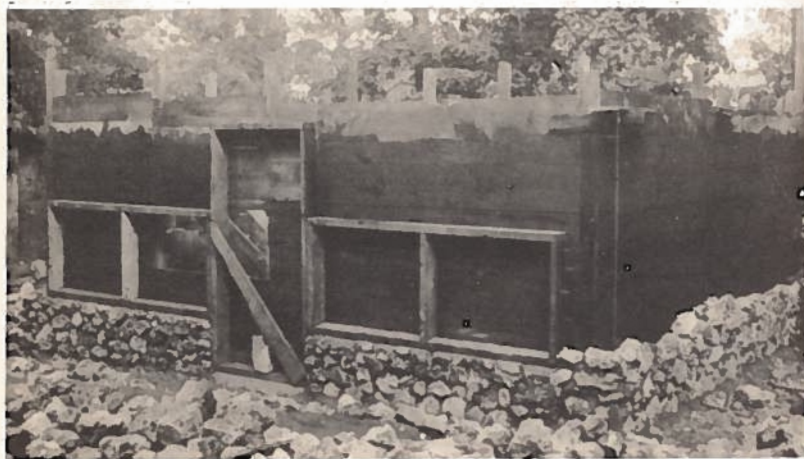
Complete inner forms were built before rock walls were started. Window frames and door frames are nailed on outside of forms.
